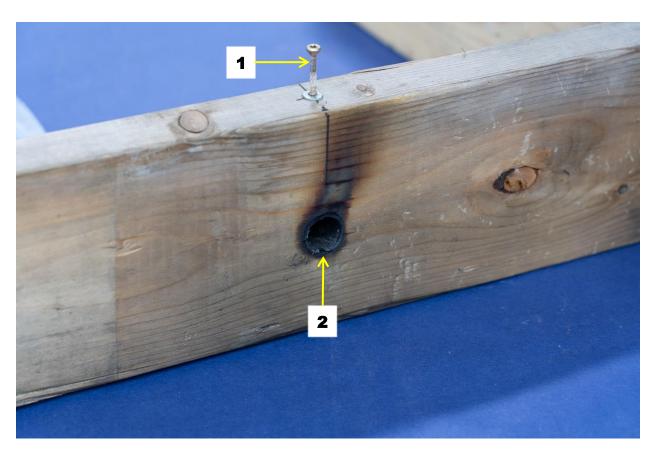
A photograph showing the charred bored hole inside of a 2×6 .
